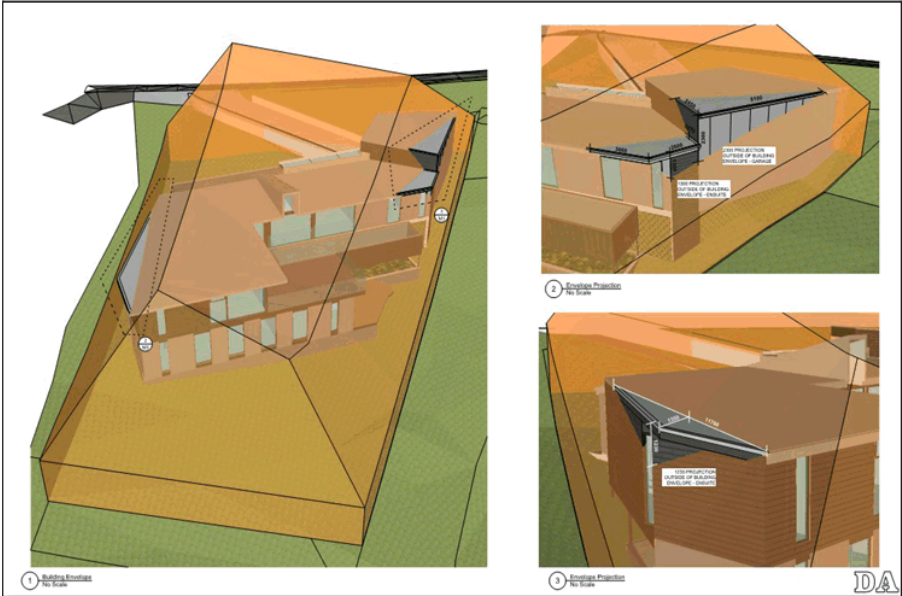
Protrusions of proposed dwelling from Low Density Residential Zone building envelope.
